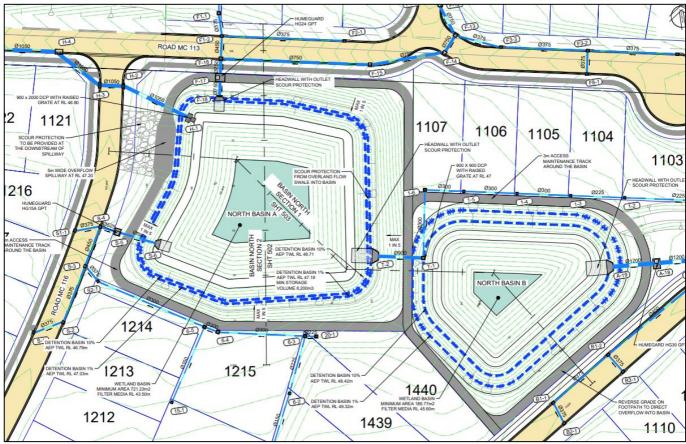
Extract of Proposed North Basin (Source, BRS: 2024)
